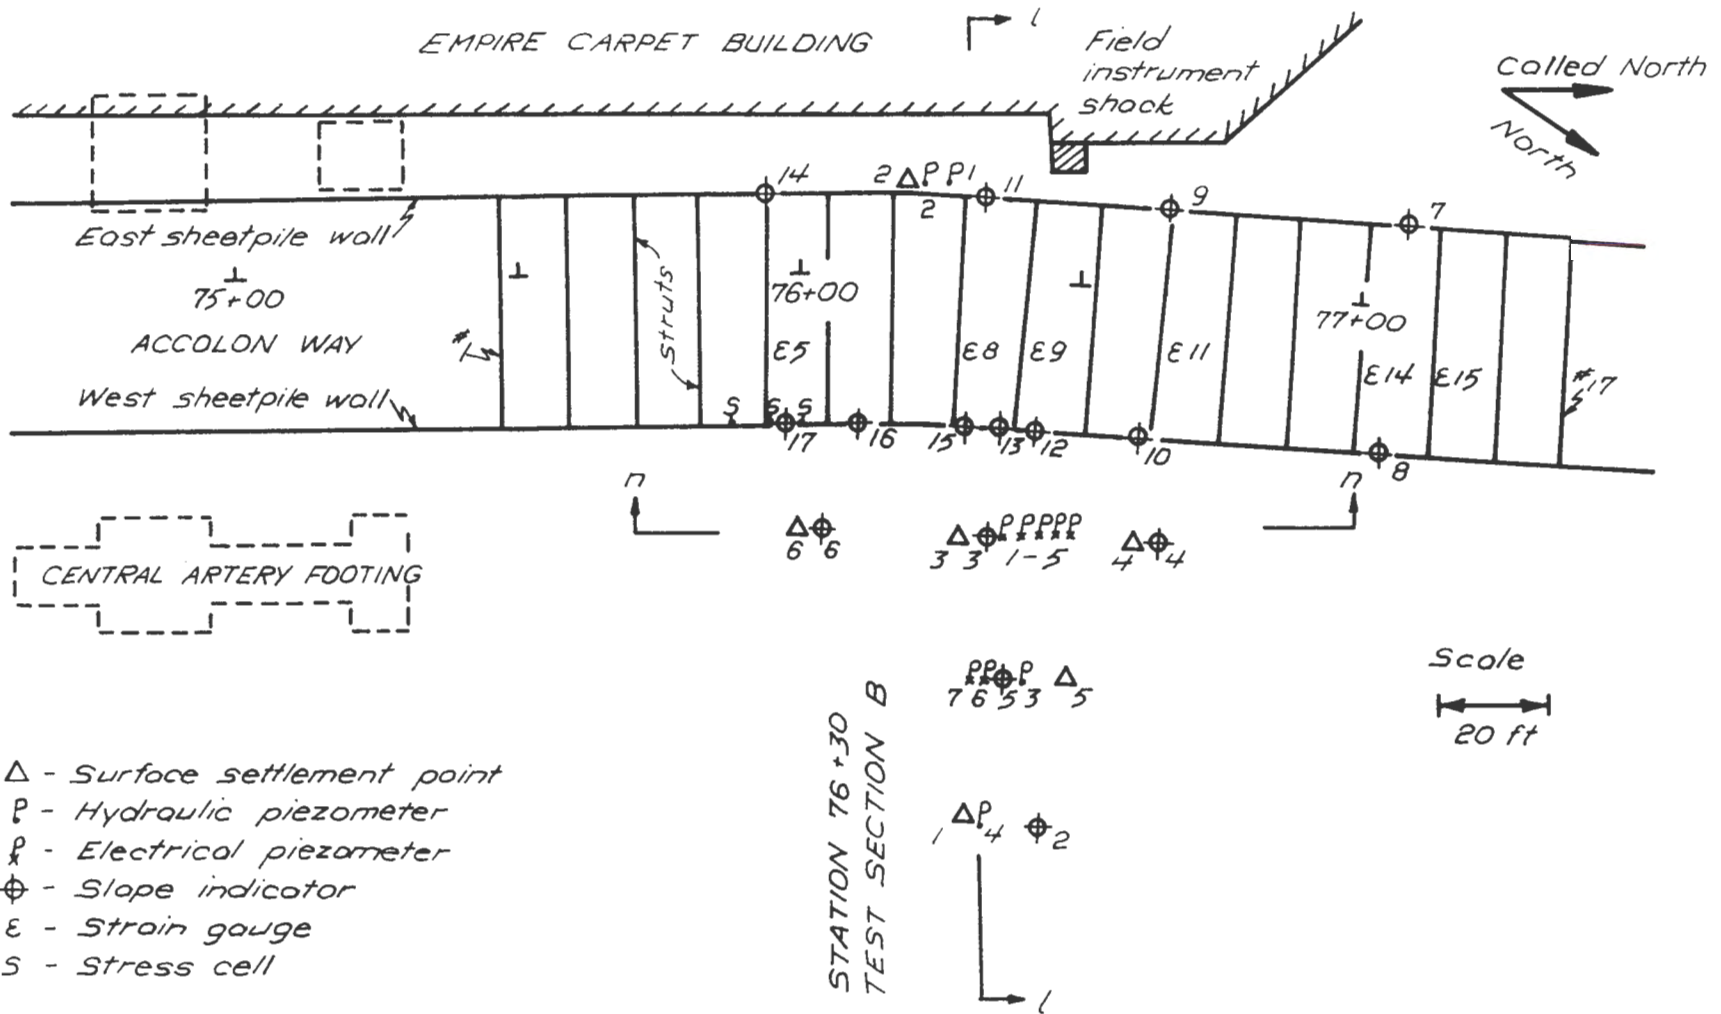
PLAN VIEW OF TEST SECTION B
